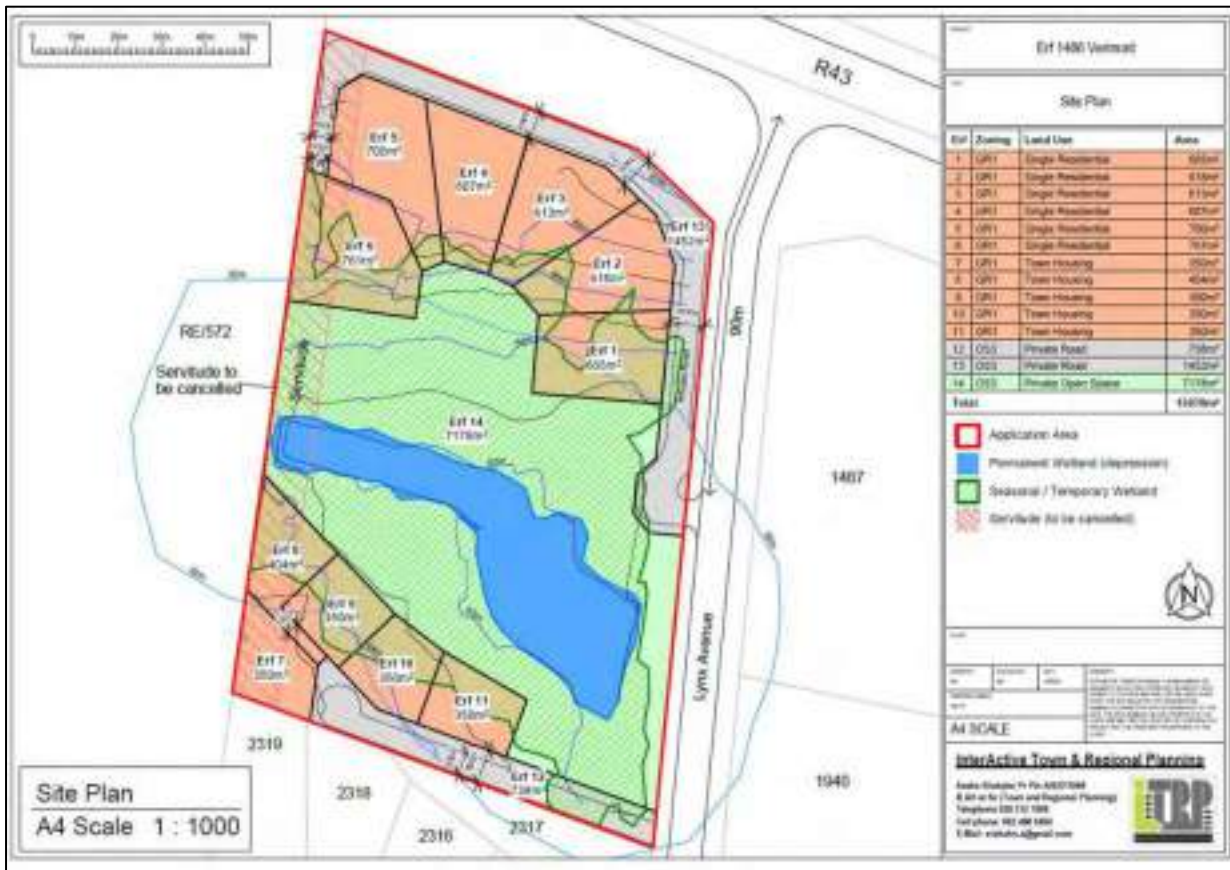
Preferred Layout (Alternative 4) for the site.
